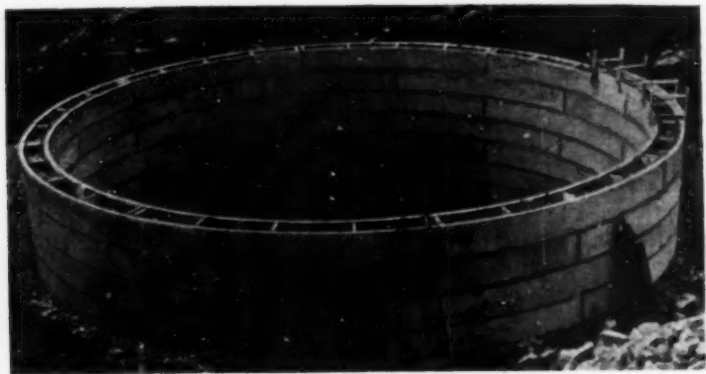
Precast Segmental Wall at Top of Surge-Shaft.
